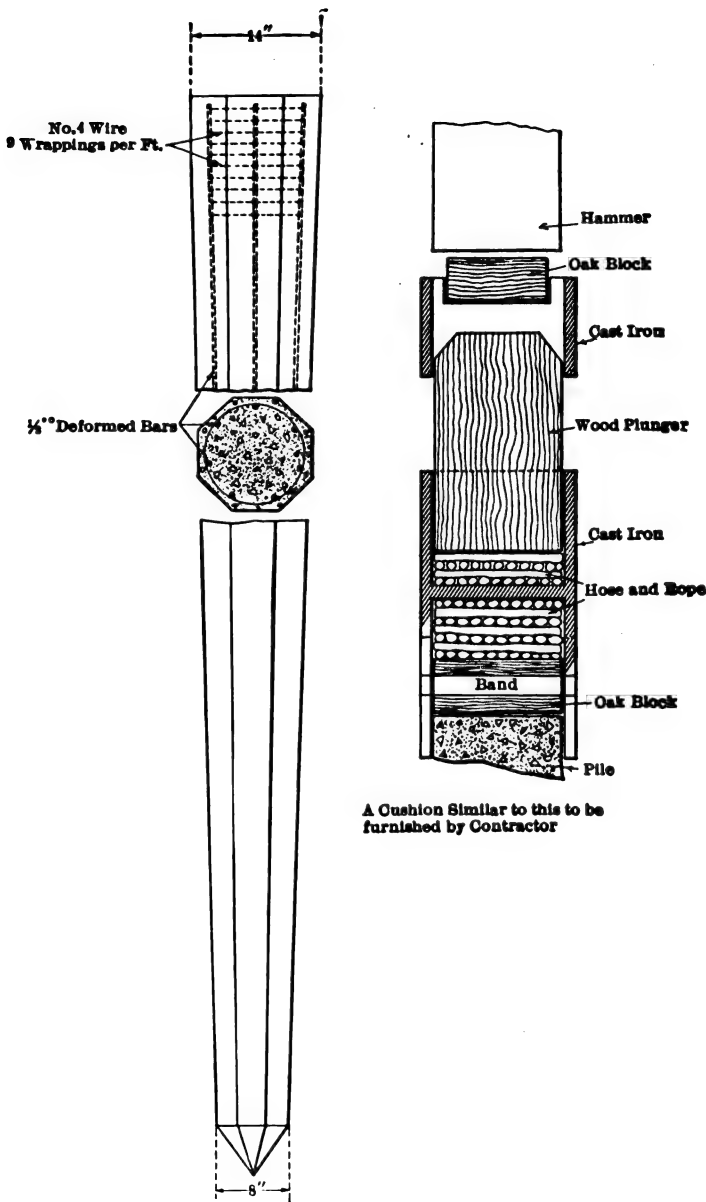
REINFORCED CONCRETE PILE AND DRIVING CAP.
